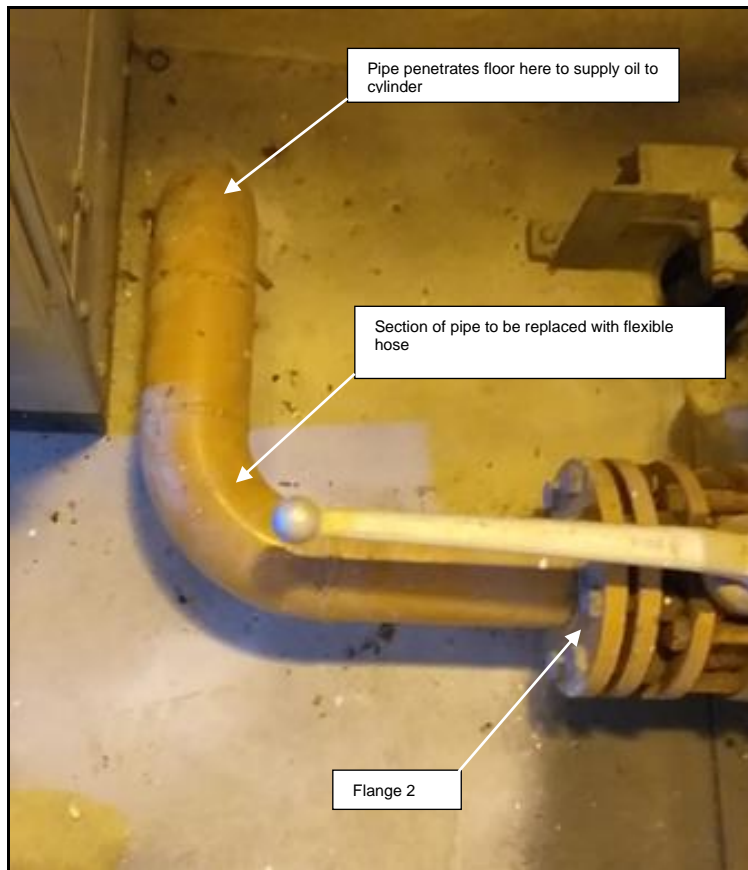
Hydraulic Supply Pipe from Power Pack Side
